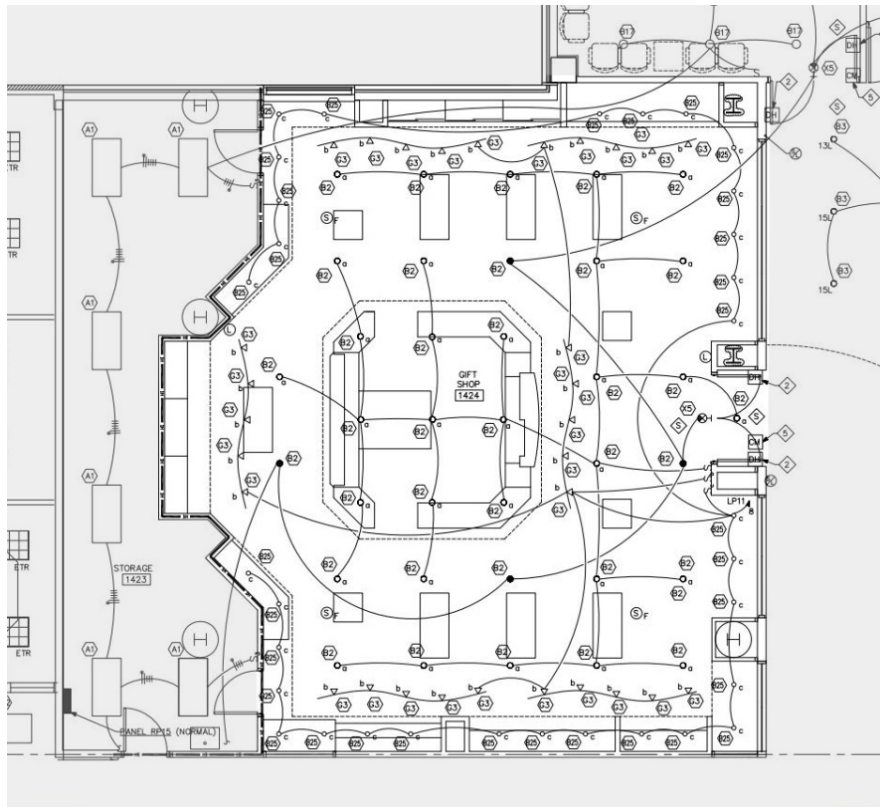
Gift shop floor plan, not to scale (dwg. E4.1G)
